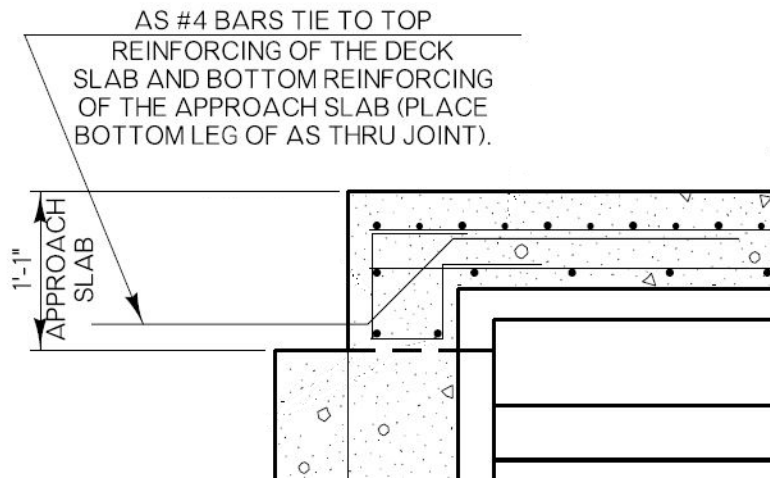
Longitudinal Steel from Deck to Approach Slab Example
